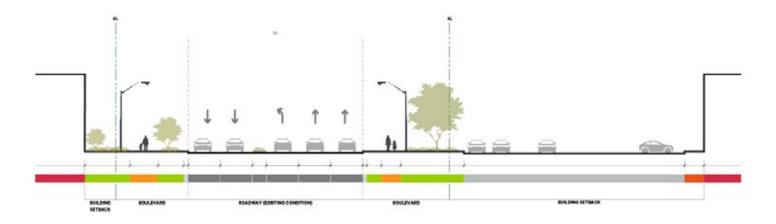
Existing Markham Road Cross-Section Typical Right-of-Way (Subject to Revision)
